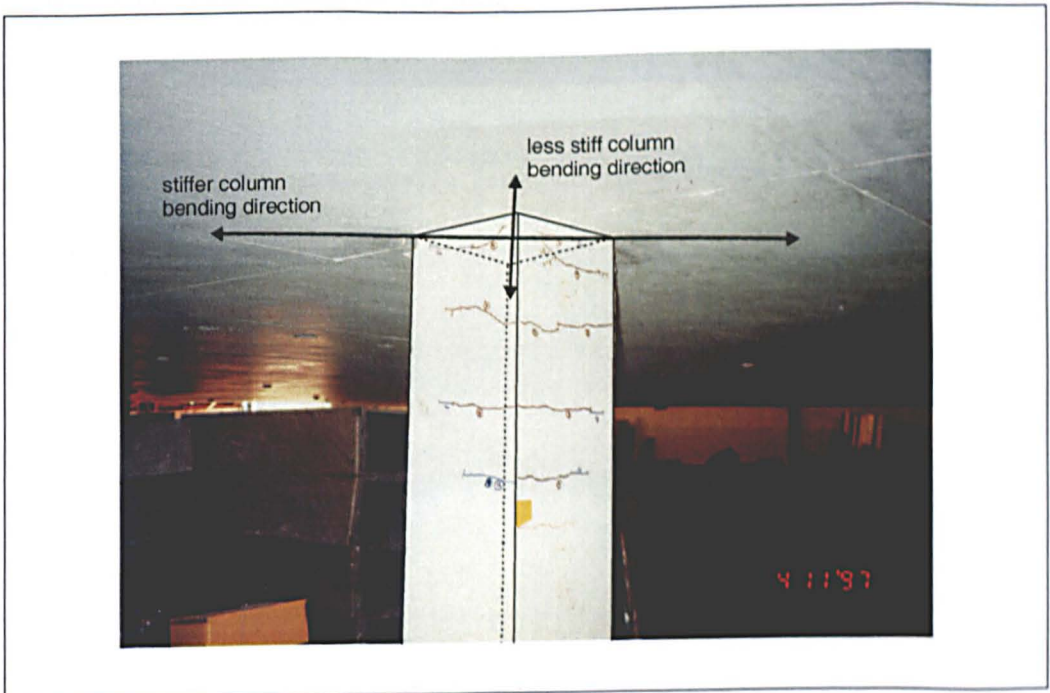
Structure B - Crack Pattern Observed on Columns.
